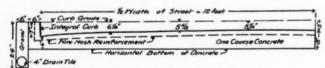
HALF SECTION OF CONCRETE ROADWAY.
